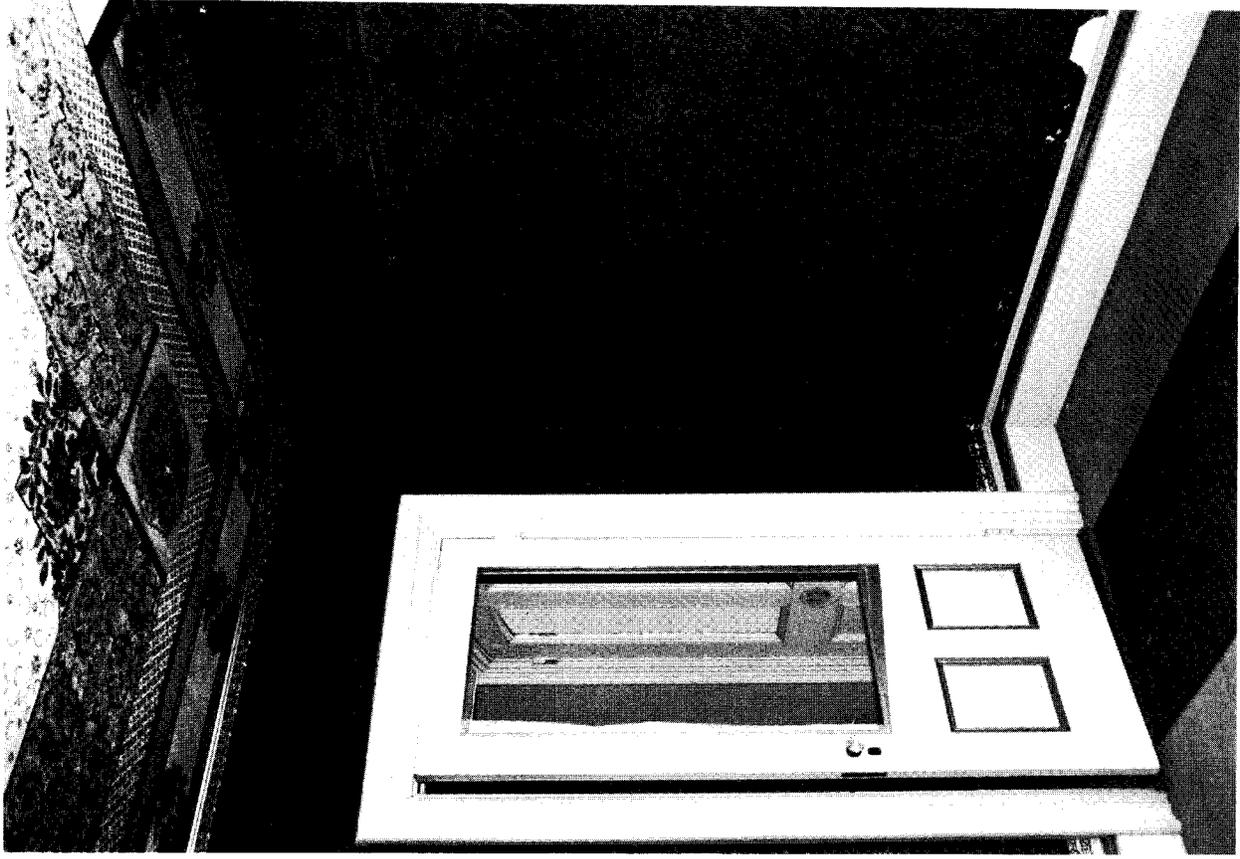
Penniman House: Northwest Parlor (Room 103), Southwest Corner (1984).
